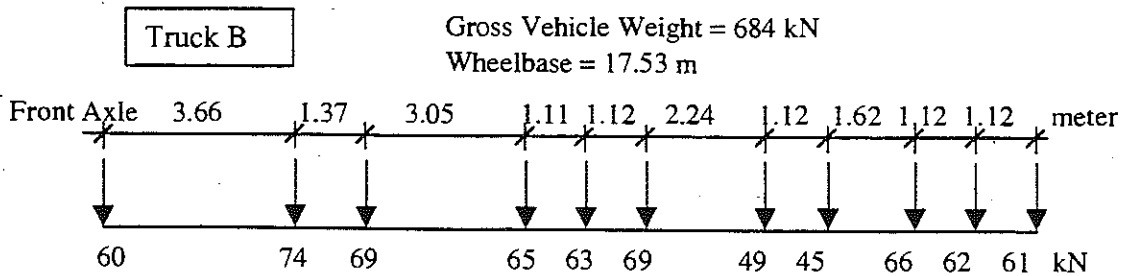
Truck B Configuration, Bridge M66/RR (R01-78054).
